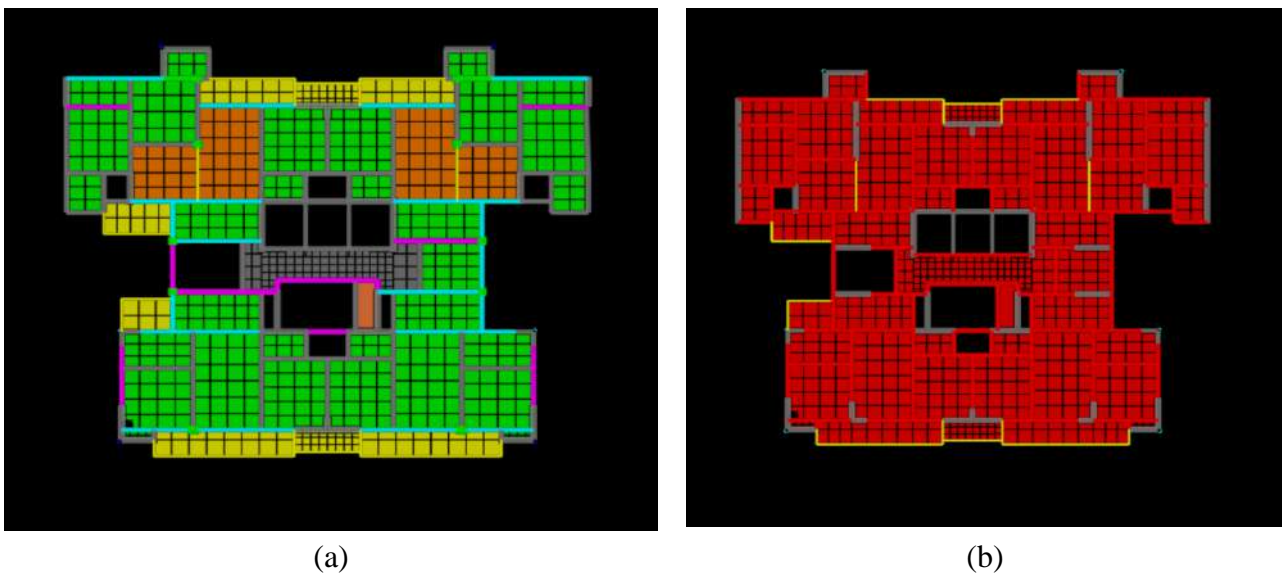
Slab Layout Plan (a) Dual System; (b) Shear Wall System
